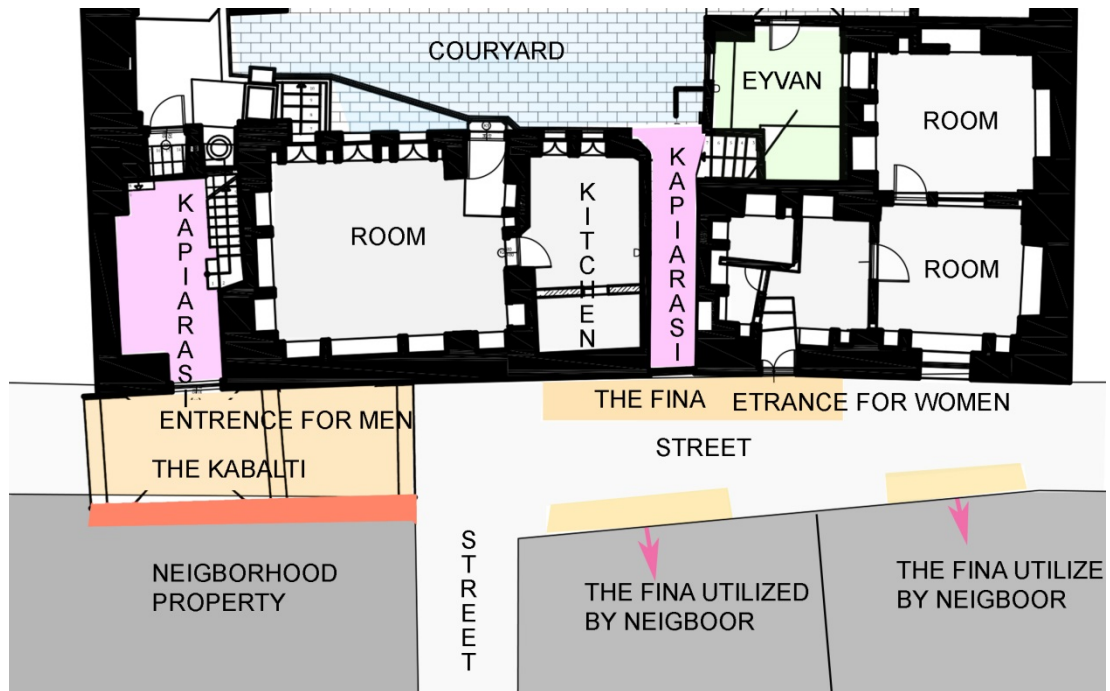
Zoning of the ground floor plan of İbrahim Halil Güngür Kabaltı House
